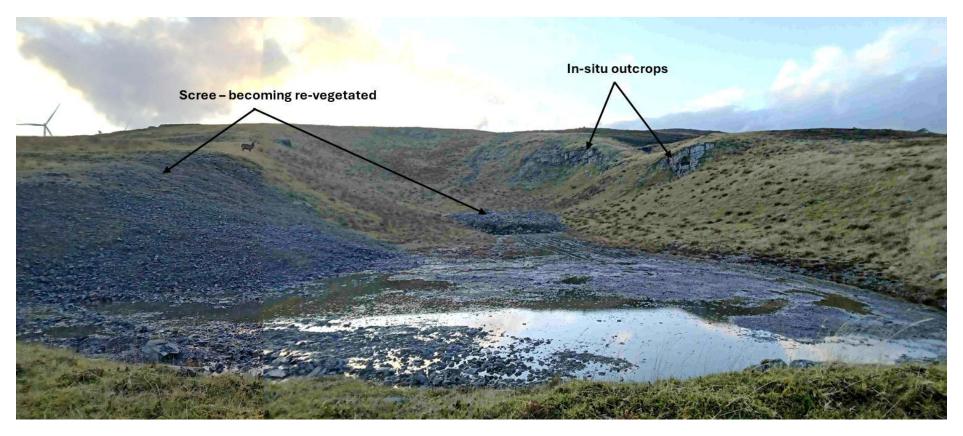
Photograph Set 1, BP01, existing borrow pit proposed for extension. View towards the west.
